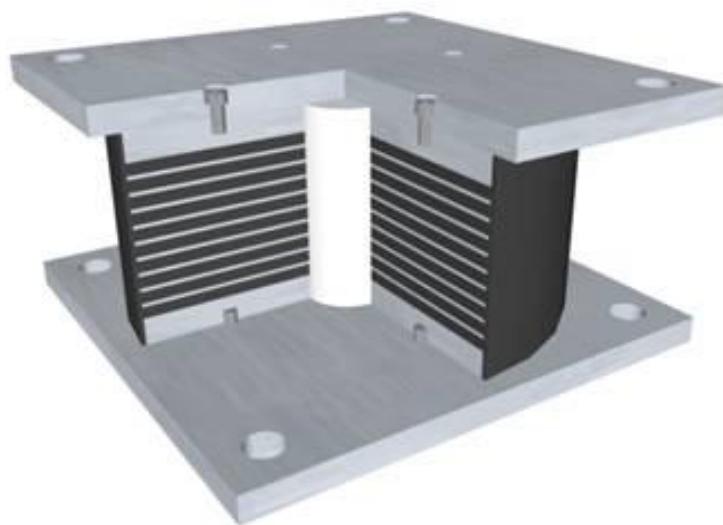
Cut-out view of a typical Lead Rubber Bearing.
